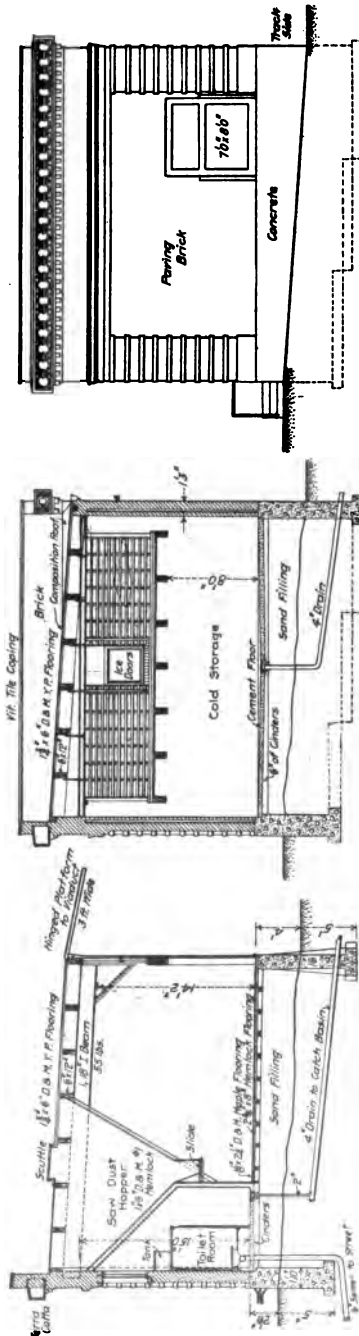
End Elevation and Cross-Sections of Freight House.
